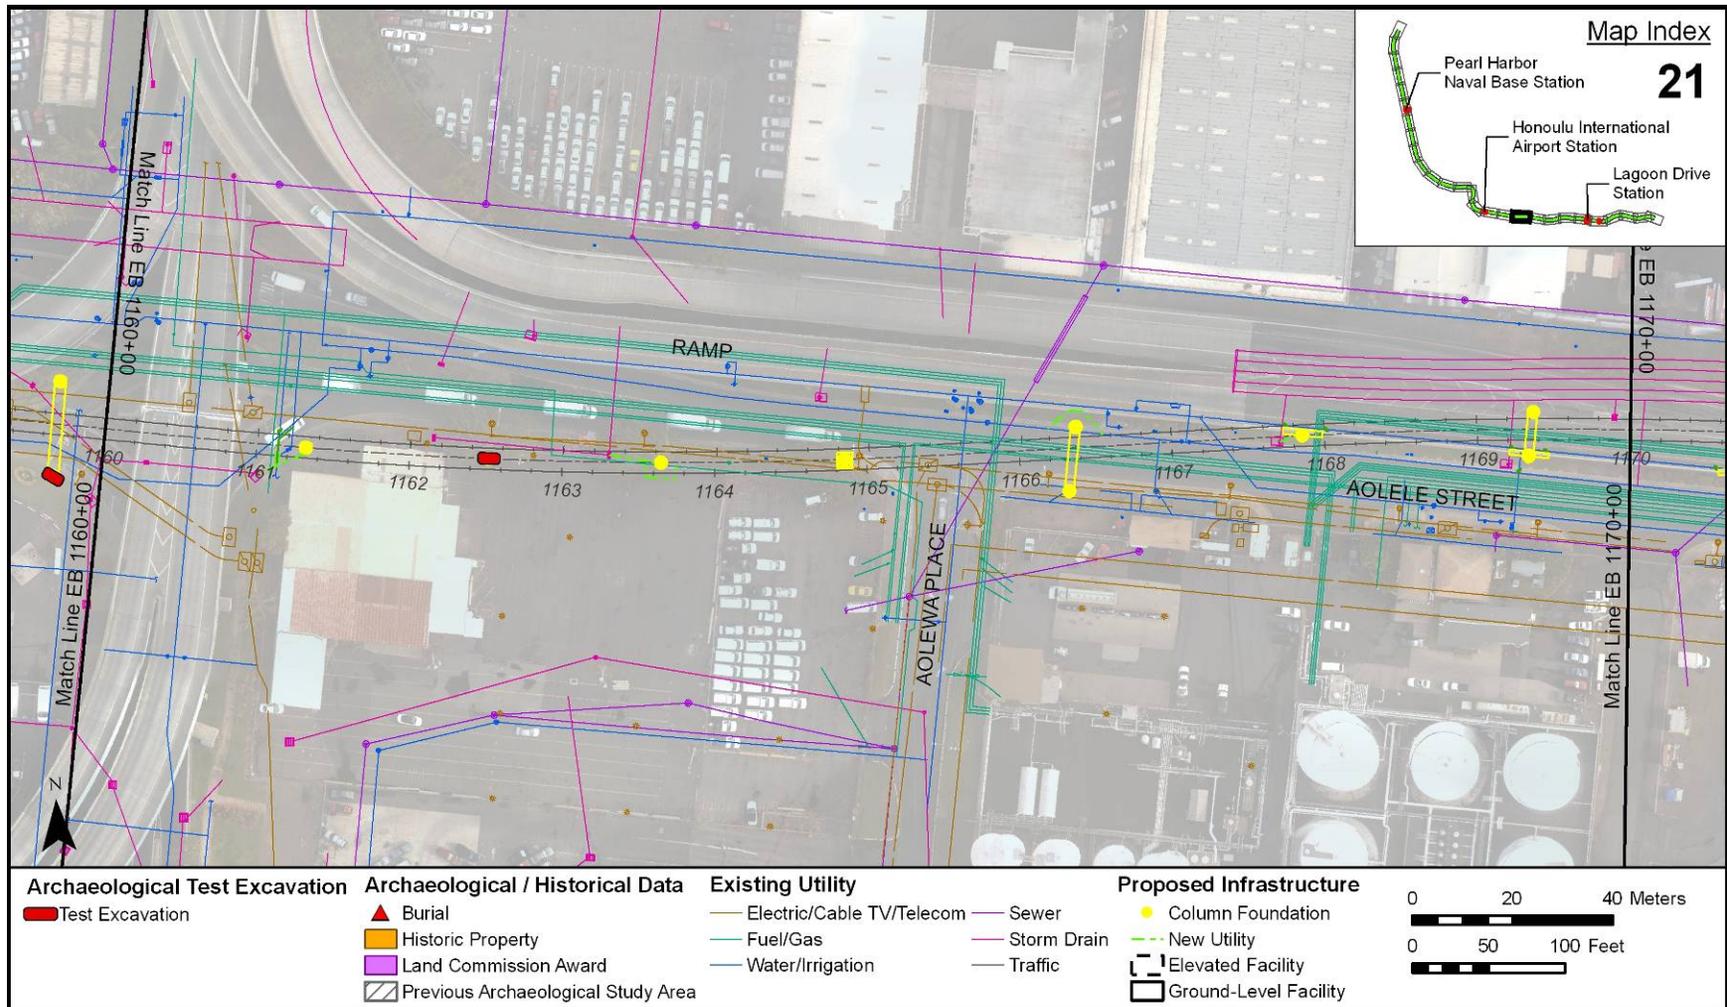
Map Sheet J 21, one 10x3 excavation at (*makai*) column foundation @ 1162+50
